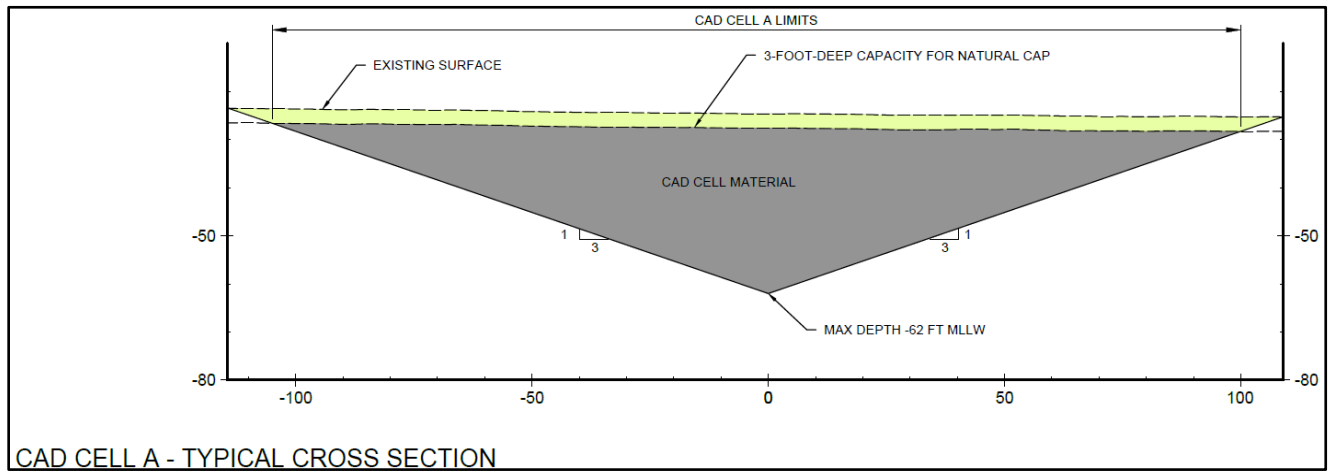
Searsport Harbor Starter CAD Cell A Dimensions
